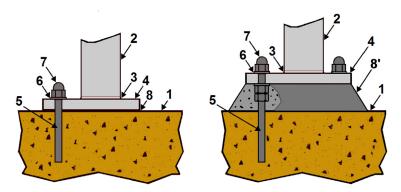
If the equipment is heavy, the contact face of the foot (2) with the floor (1) must be sufficient to absorb the pressure. To distribute the load, feet should be provided with a footplate (4) welded to the foot leg (3). The foot may be fastened to the floor by means of (a) stainless steel anchor bolt(s) (5) which must have (a) seal washer(s) (6) and (a) dome nut(s) (7) fitted. When the equipment must be bolted to the floor, floorplates shall be sealed with polymer material (e.g., epoxy) to the floor (figure left, 8). The bolting hole(s) must be sealed so that water and dirt are not allowed to leak into the hole(s). Grouting with concrete (figure right, 8') is not recommended (Moerman & Kastelein, 2014).
